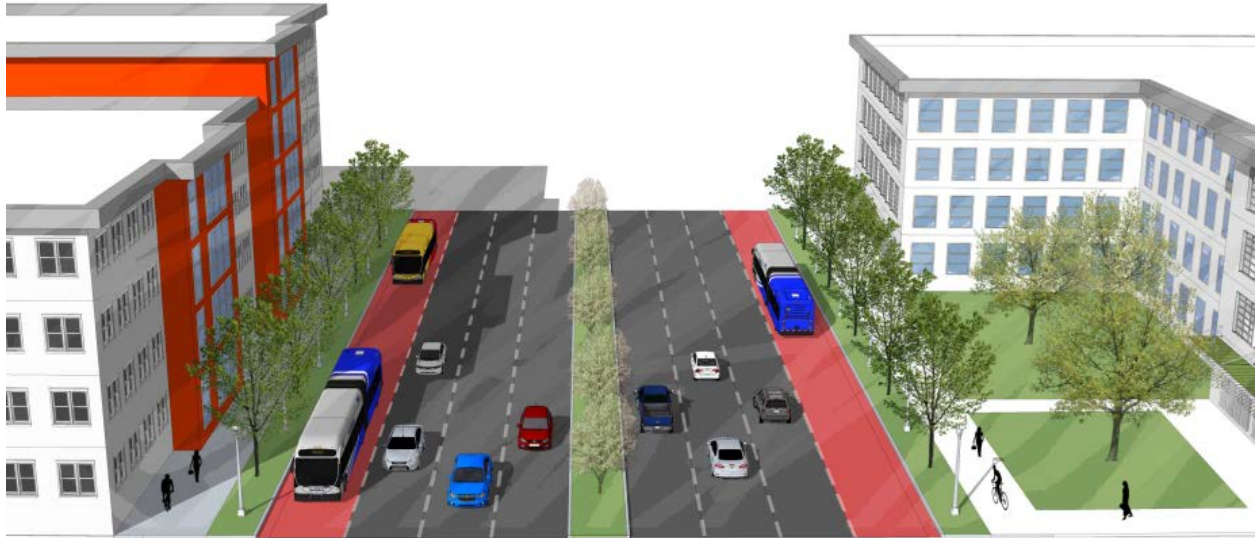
Alternative 2: BRT – Curb, typical section (Pohick Road to Woodbridge VRE)
